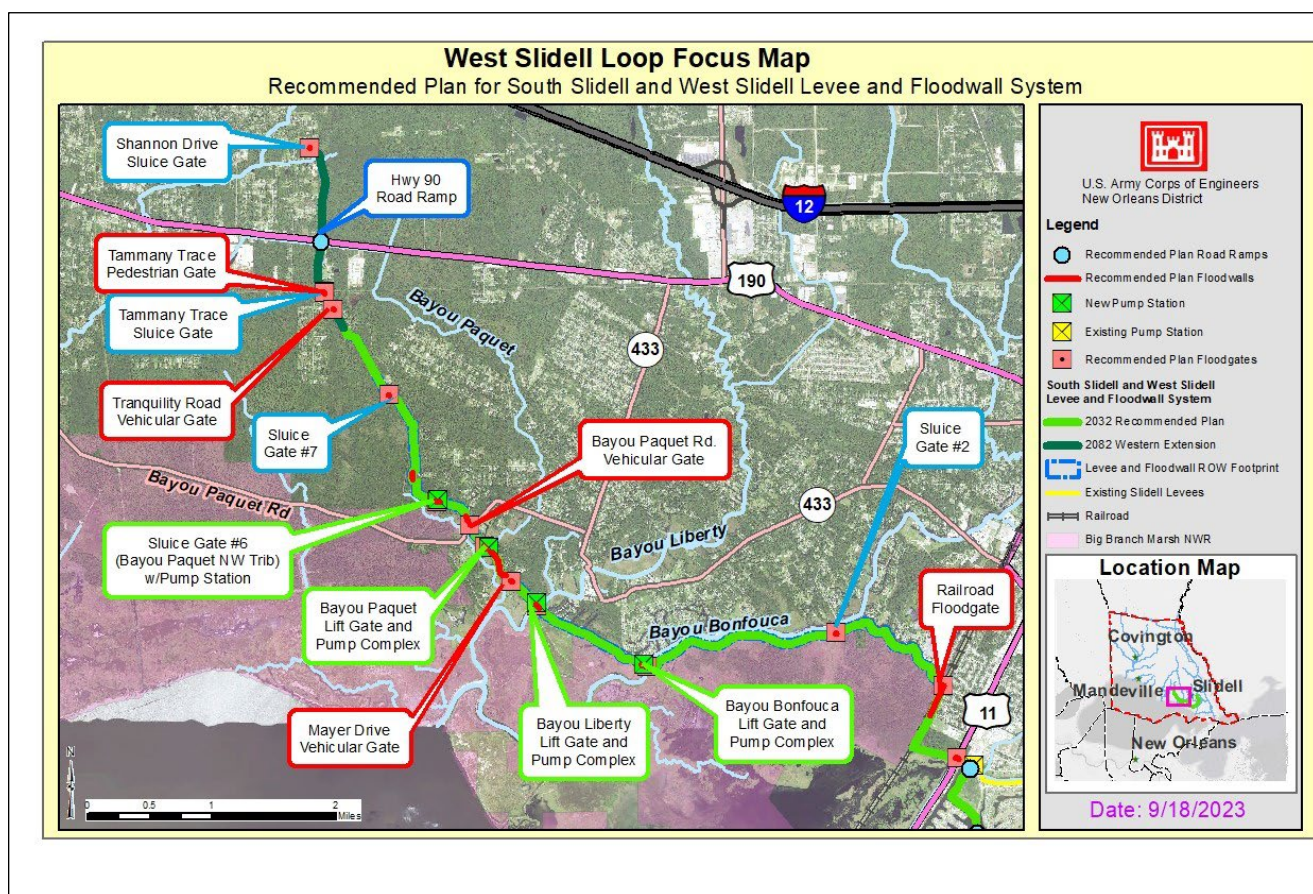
From Appendix D: Engineering Figure D:10-4 West and South Slidell Levee and Floodwall System – Optimized Tentatively Selected Plan Focus with Structures
